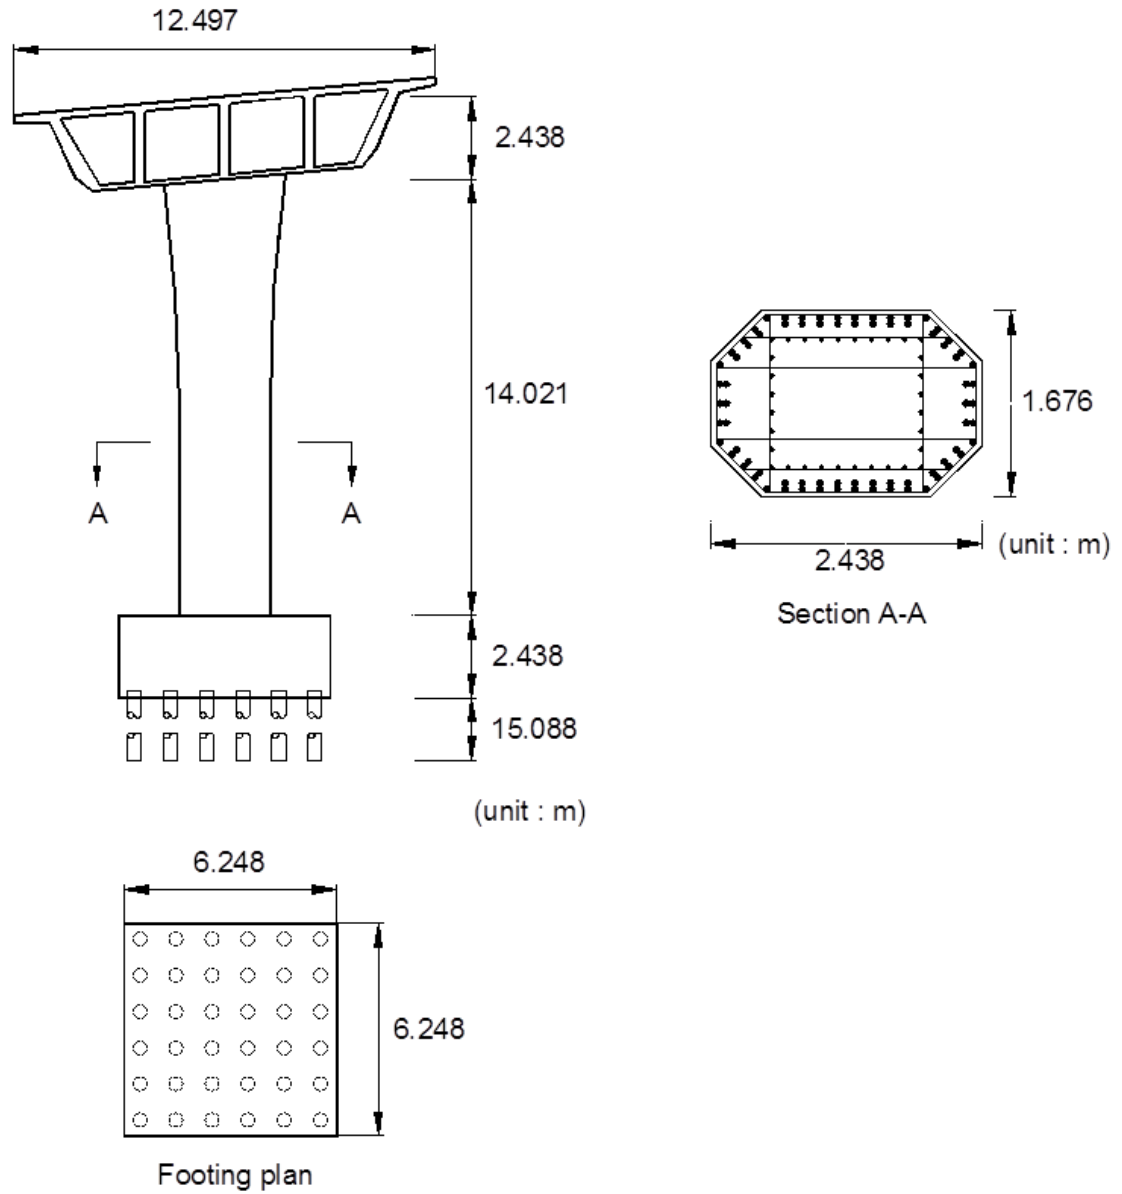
Elevation view of the single column bent and footing plan (Bent 8 of the North-West connector)
